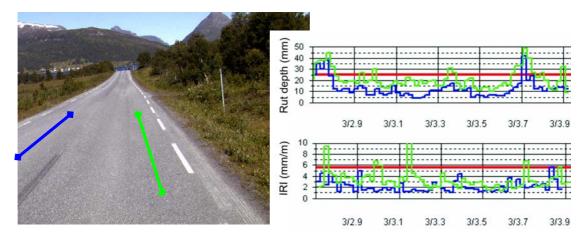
Example of road Rv-861 in Senja Norway about deformation on upper side of the road.
